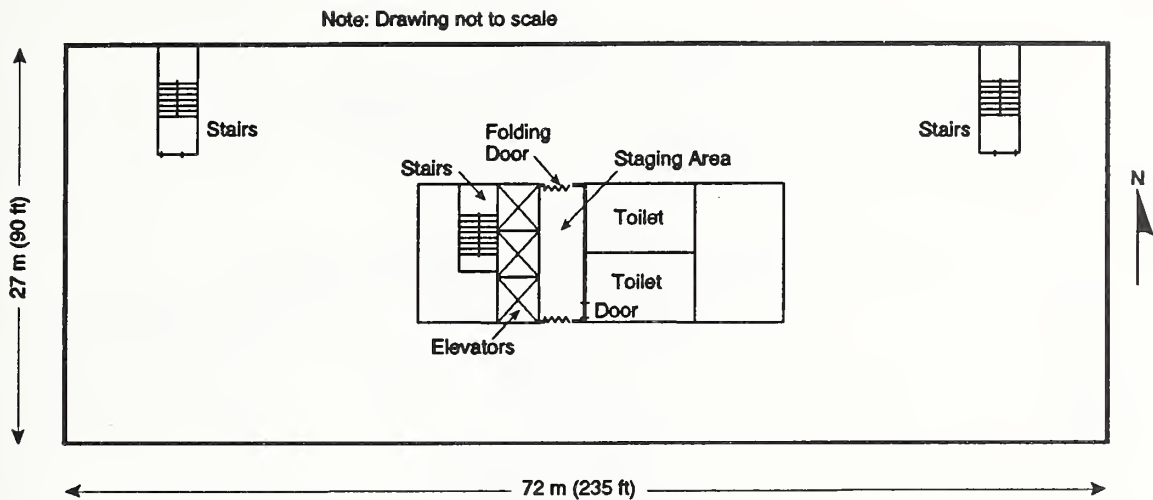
Typical plan of floors 2 through 7 of the Toledo Federal Office Building
